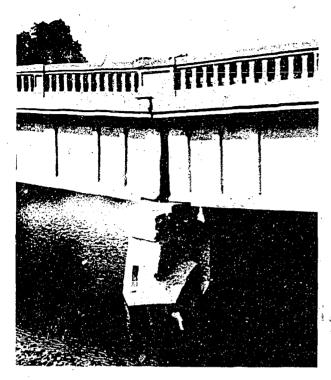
Pier settlement due to scour. Note pier and deck cracking.
